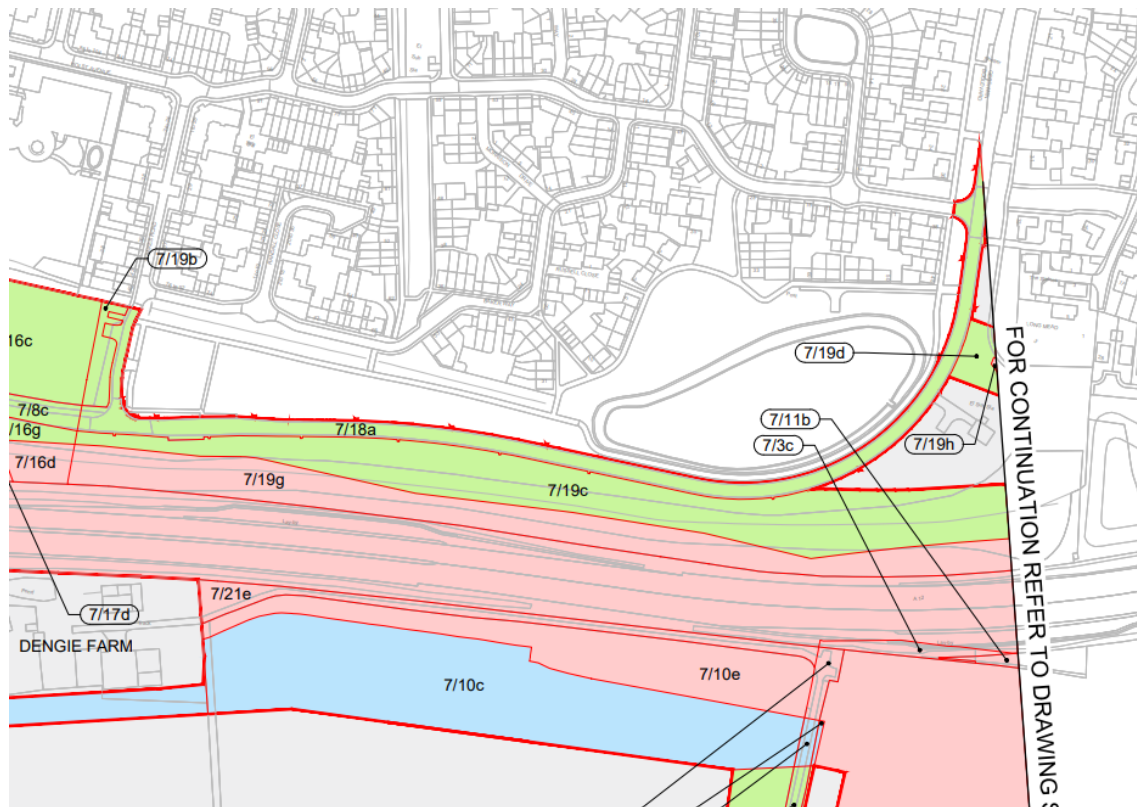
Alternative location for Gershwin Boulevard bridge
